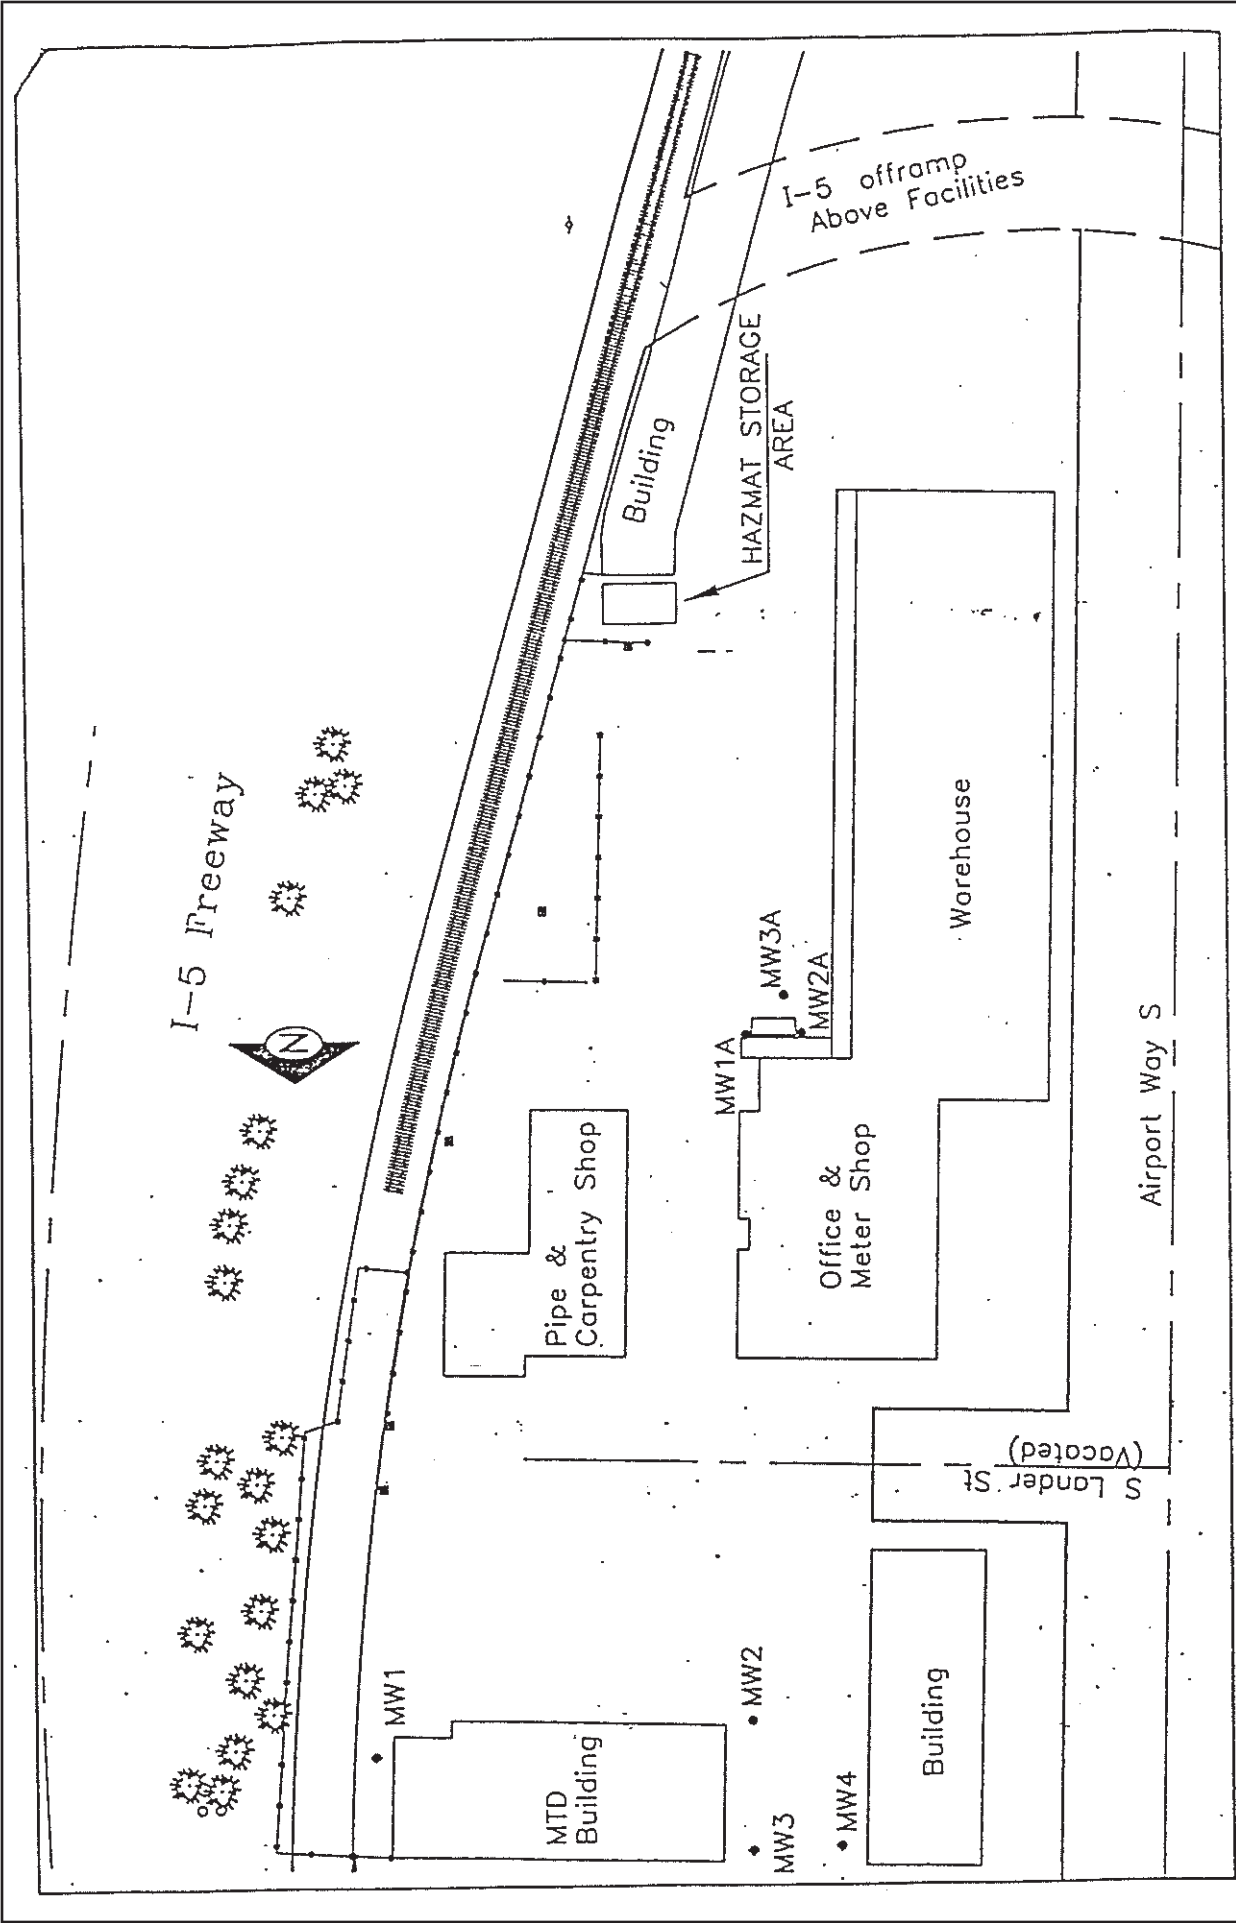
Seattle Public Utilities Operations Center Facility Plan
